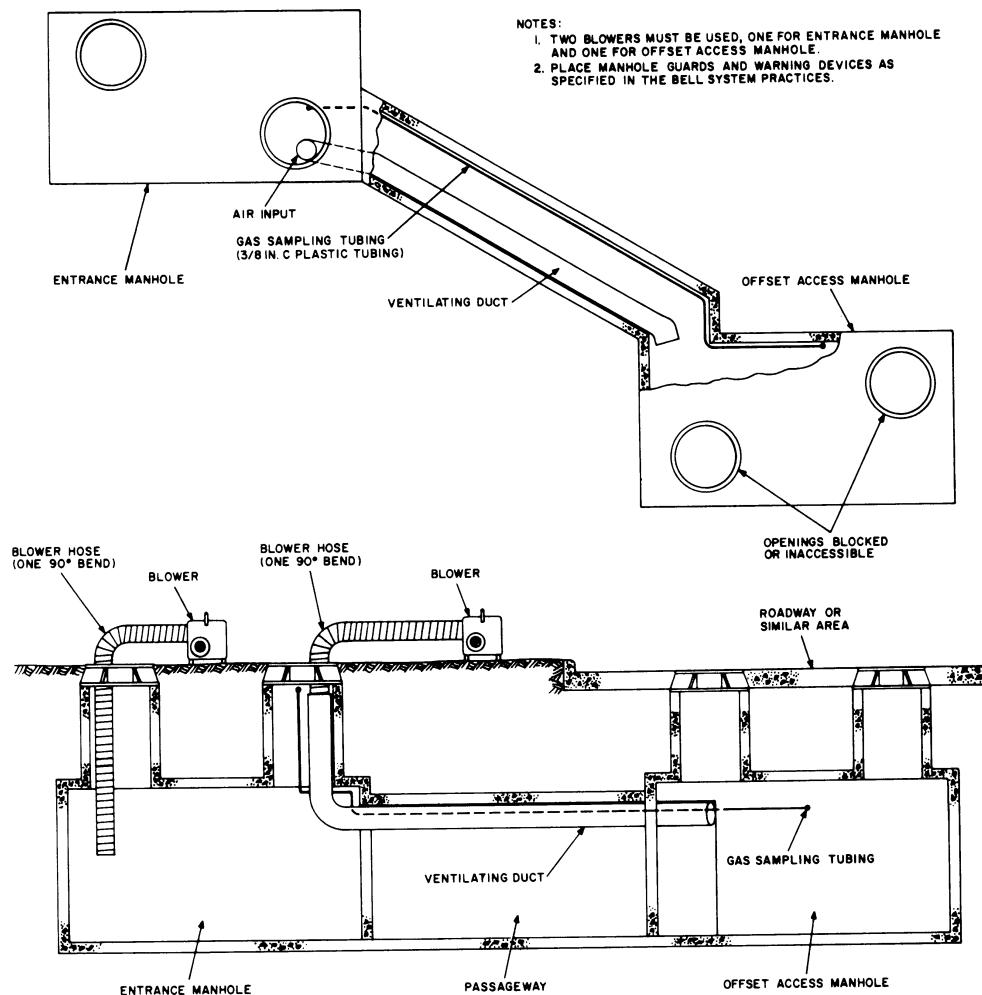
Typical Setup for Purging Offset Access Manhole With Entrance Manhole
